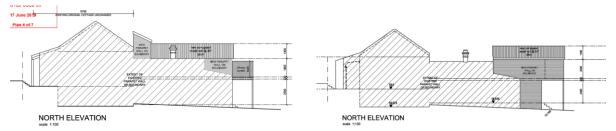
North elevation of Refused development (Left) and Deferred Plans (Right).
